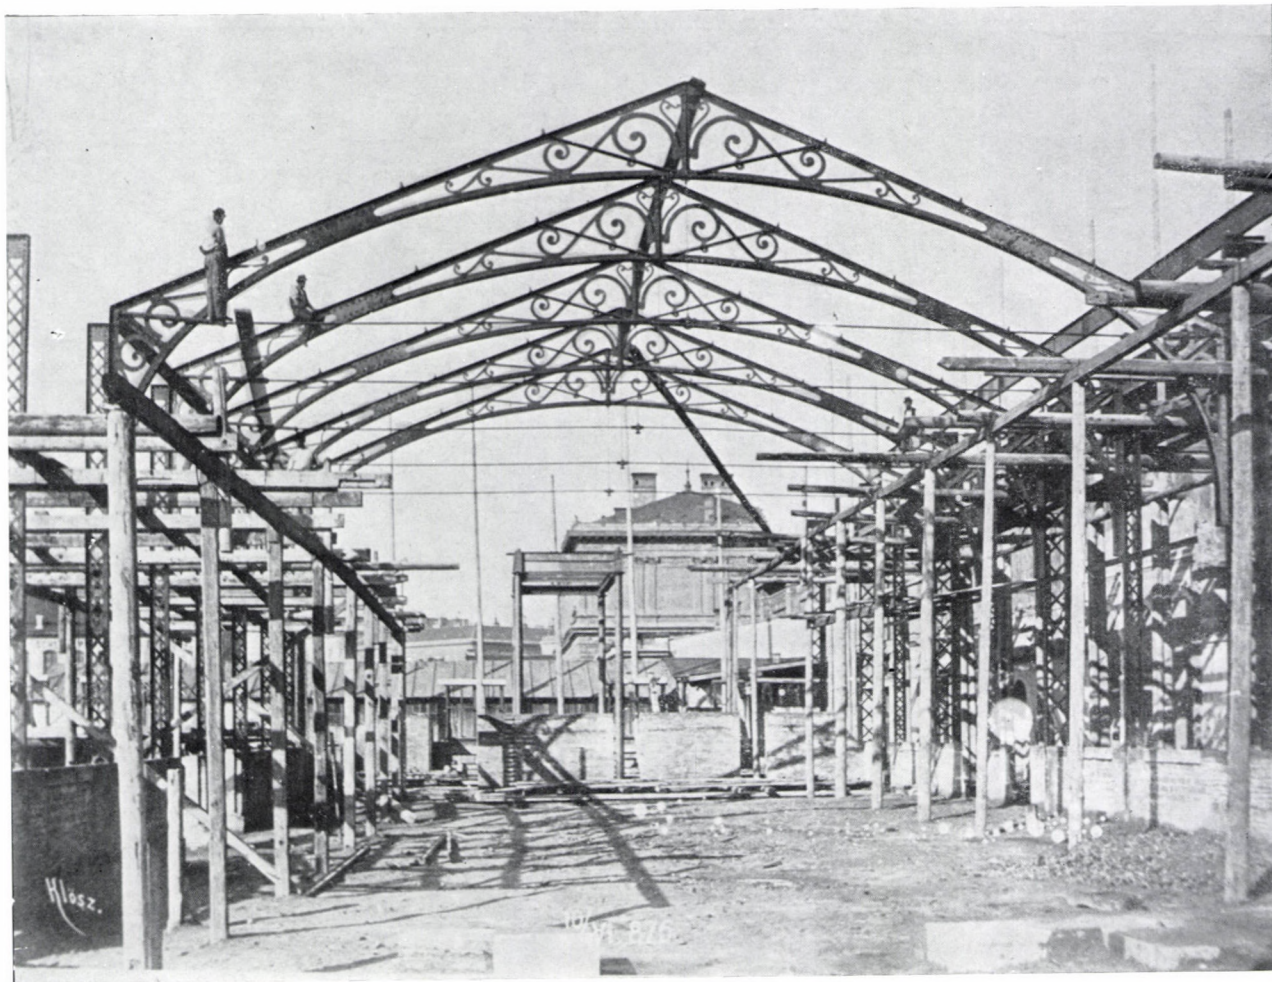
Aisle steel structure under construction (Photo by György KLÖSZ, 19 January 1877)
